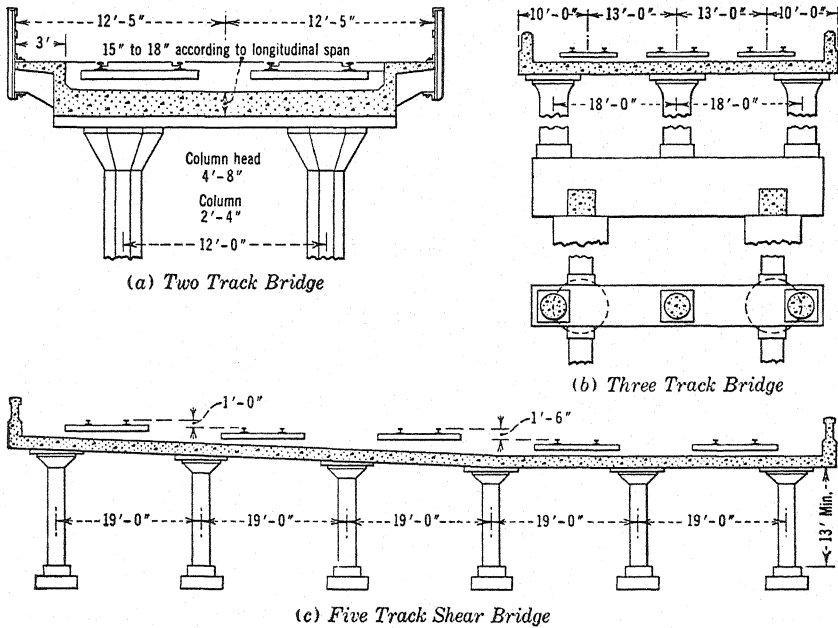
Cross Sections of Flat-Slab Railroad Bridges. (See p. 327.)
